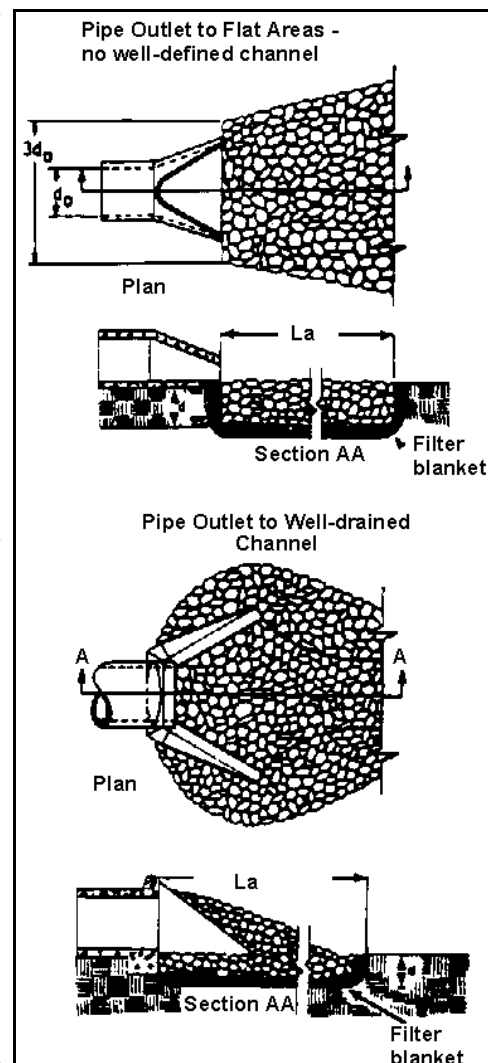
Examples of rock outlet protection designs (U.S. EPA, 1992).
